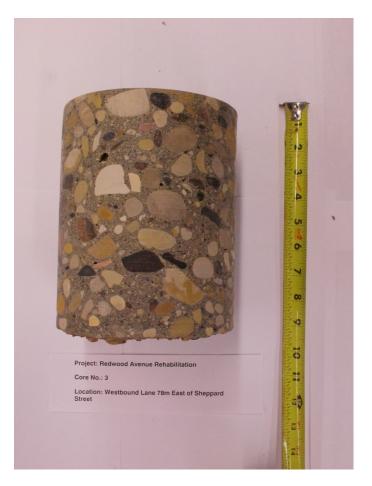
C03: Westbound lane 78 m east of Sheppard Street, 1.8 m from curb
